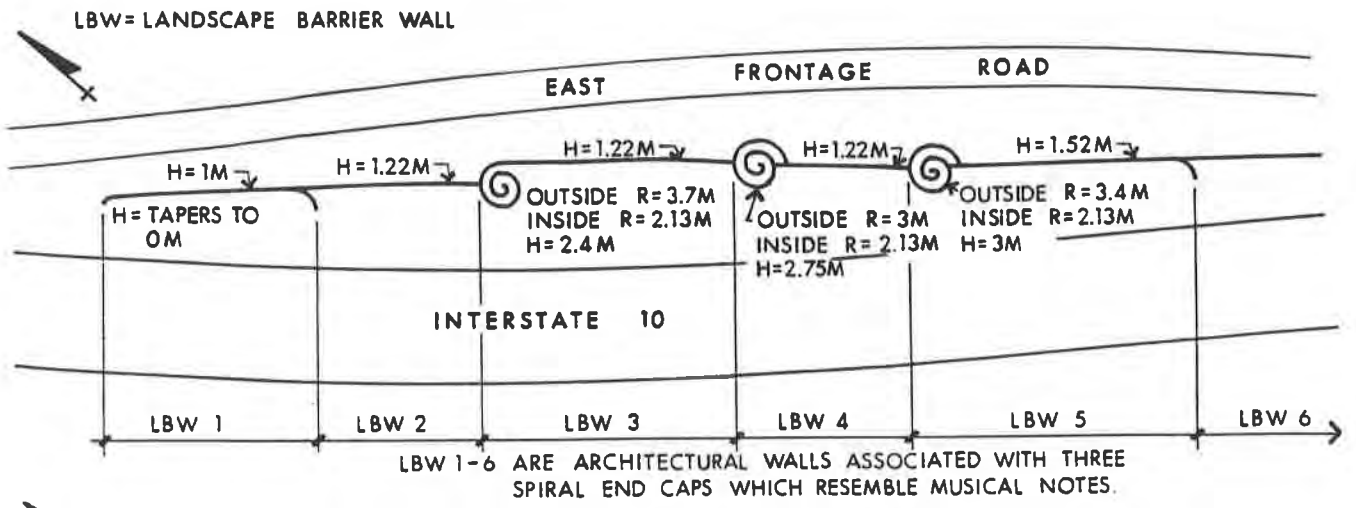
Site Plan View Showing Wall Layout - 'Fiesta Texas' Interchange
